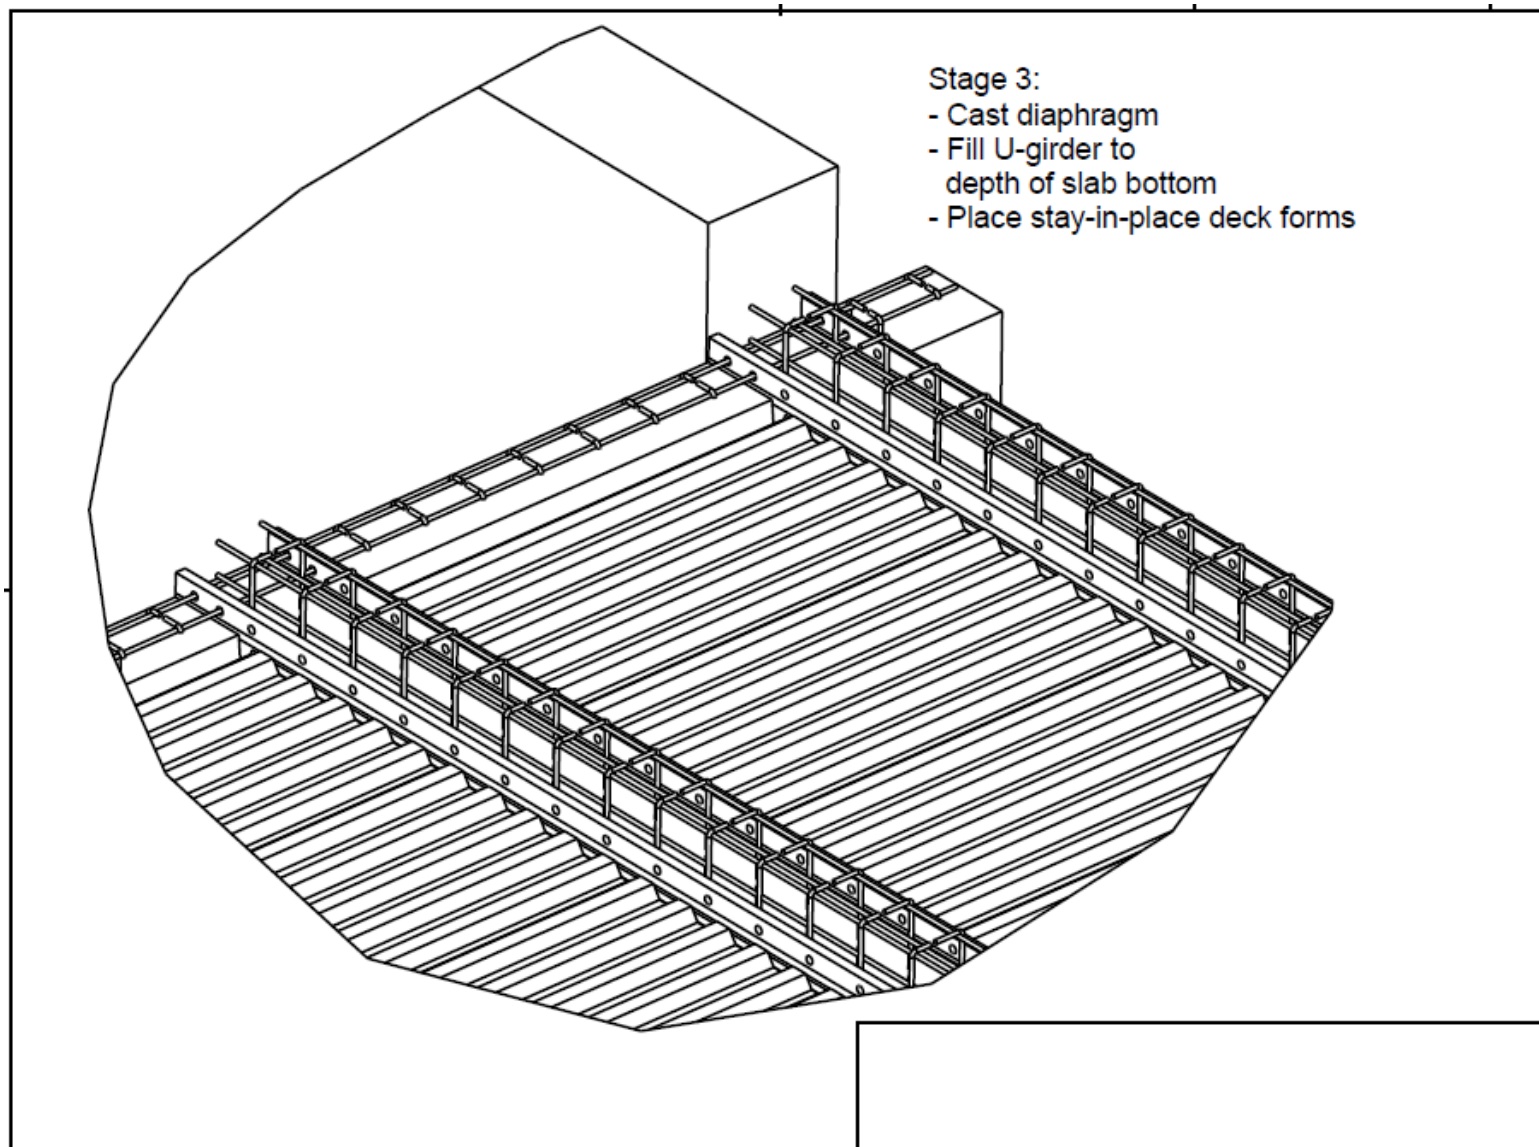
Casting diaphragms, filling U-girders, and placing formwork for cast-in-place deck.
